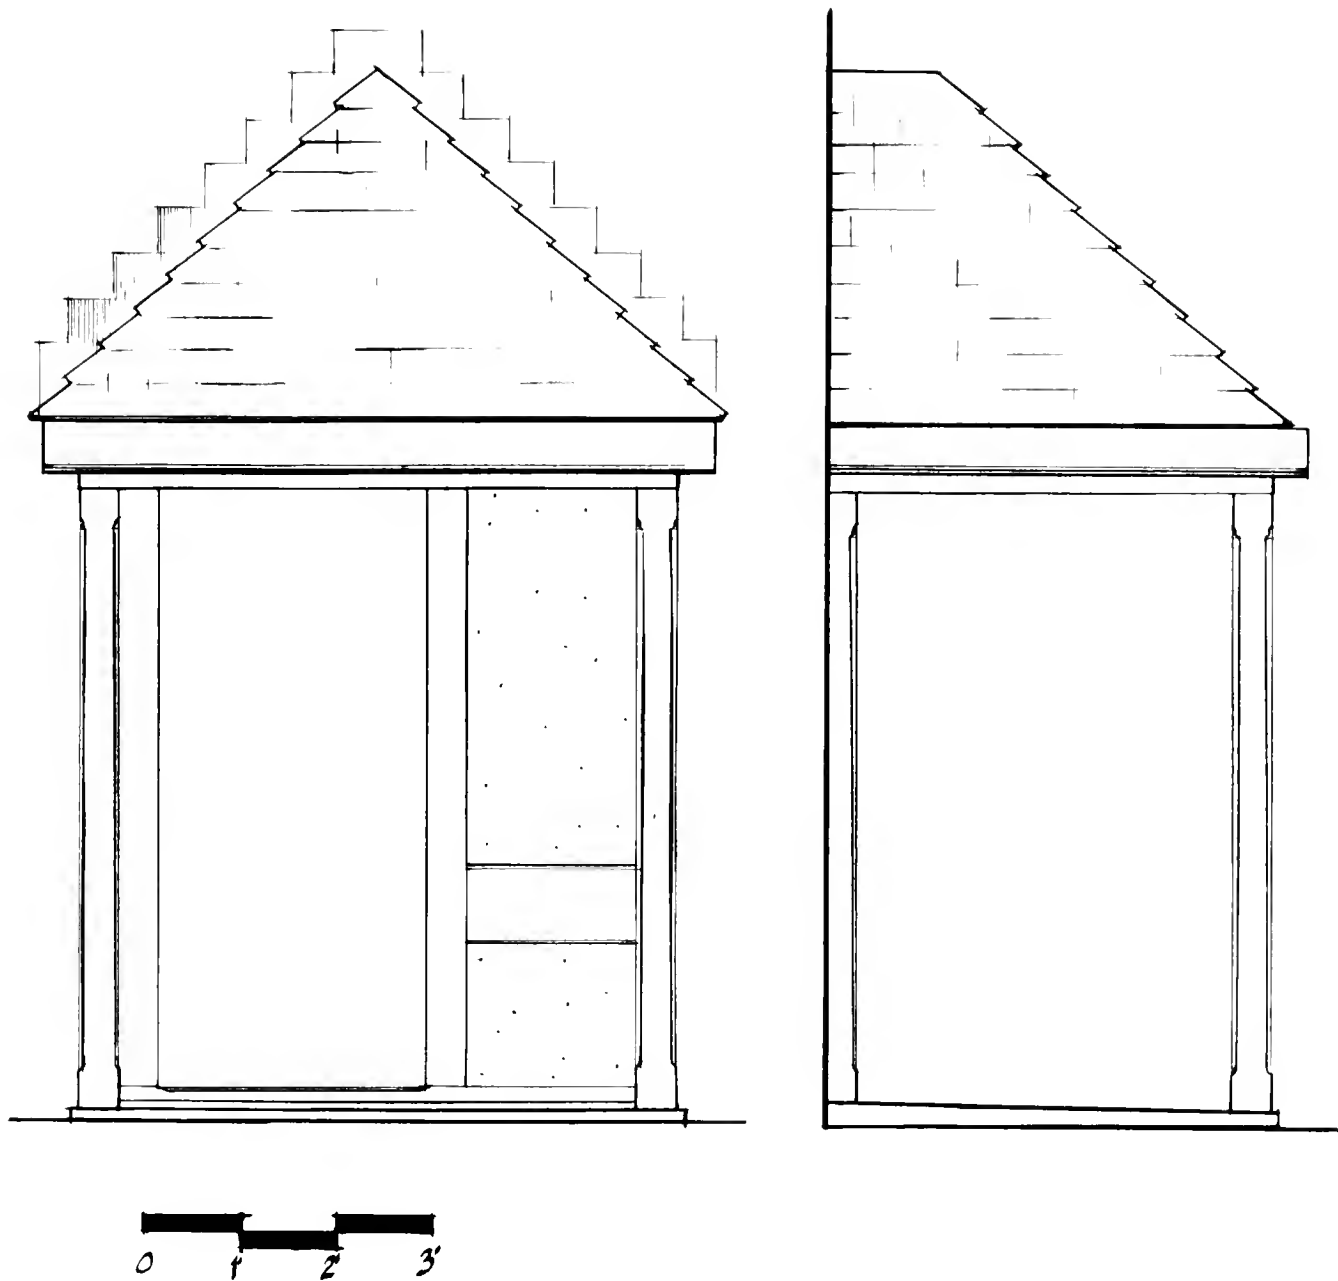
East Porch off of study. This porch has a hipped roof and is meant to be stuccoed underneath (Drawings surveyed and adapted from Okie prints).
